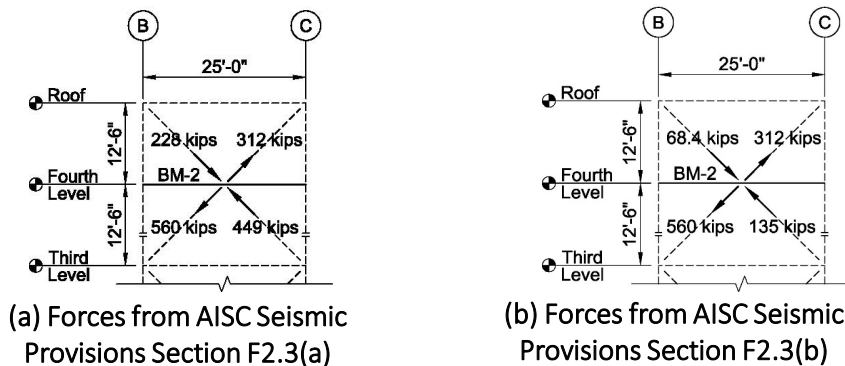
Forces acting on Beam BM-2 from a mechanism analysis of AISC *Seismic Provisions* Section F2.3 as carried out in Example 5.3.2.
